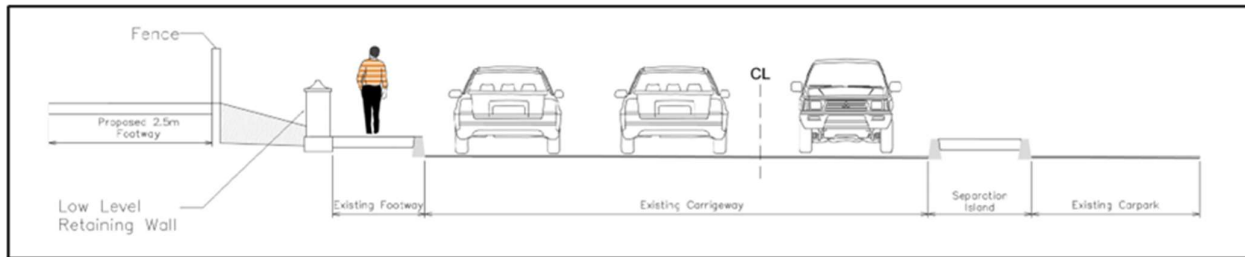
Preferred Option Section 2 - Offline 2.5m footway through lands north of existing roadway
